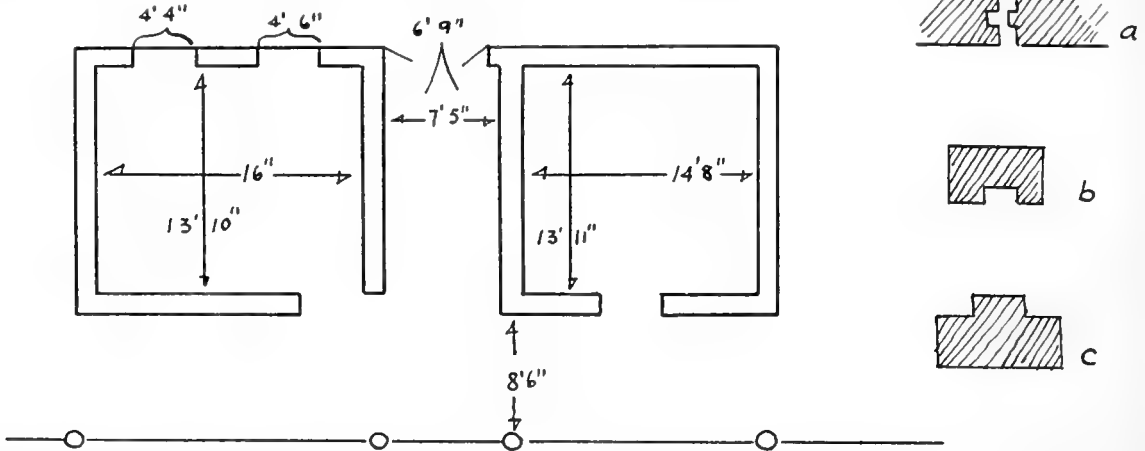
Plan of house of Pedro Chávez, Cherán. Combination masonry and wooden walls. *a* shows tongue-and-grooving of vertical plank walls. *b* and *c* show notching of beams at top and bottom to receive wall planks, and (*c*) floor planks.
